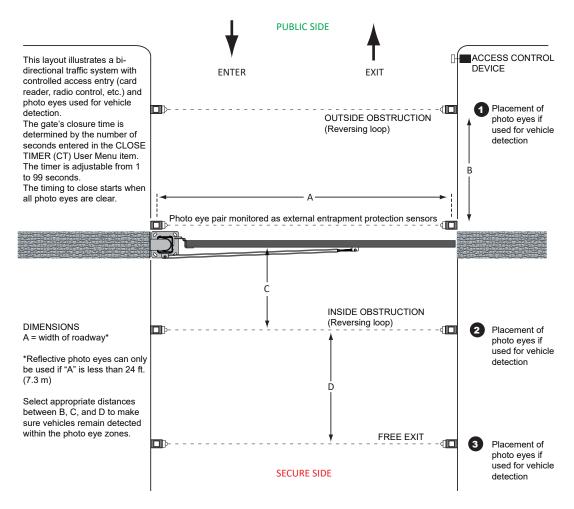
SwingRiser Photo Eye Sensor Site Layout
